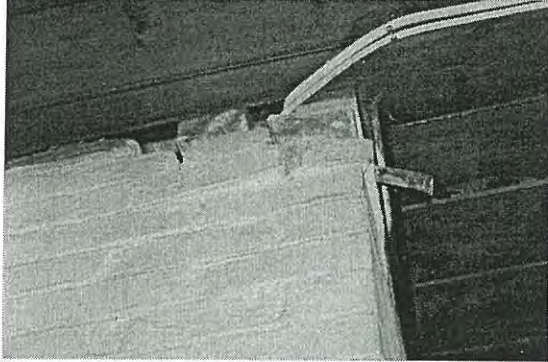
Interior, Passage (space T03). Detail of introduced electrical conduit that has inappropriately damaged the brick wall above the door into the office (space T02).
